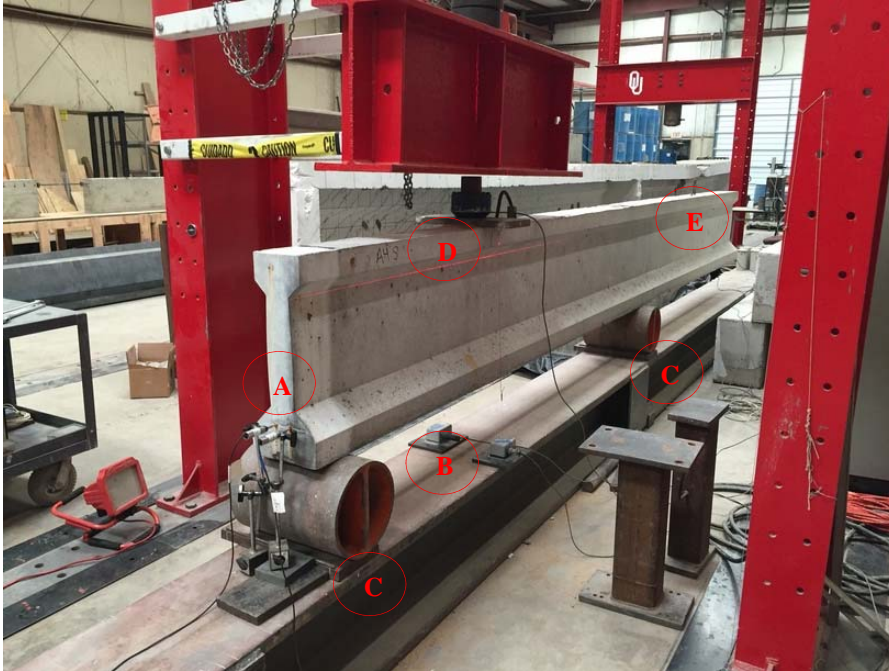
Shear Test Setup - LVDT 1 & 2 (A), Wirepots 1 & 2 (B), Supports at 9 ft. center-to-center (C), Single Load Point at 41 in. from end of beam (D), and 8 ft.-8 in. overhang of the beam (E) – looking towards the north
